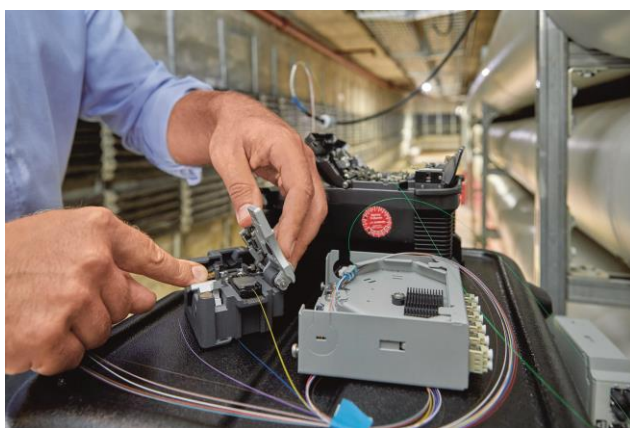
Ready-to-splice pigtails simplify the connection and installation of the splice box
